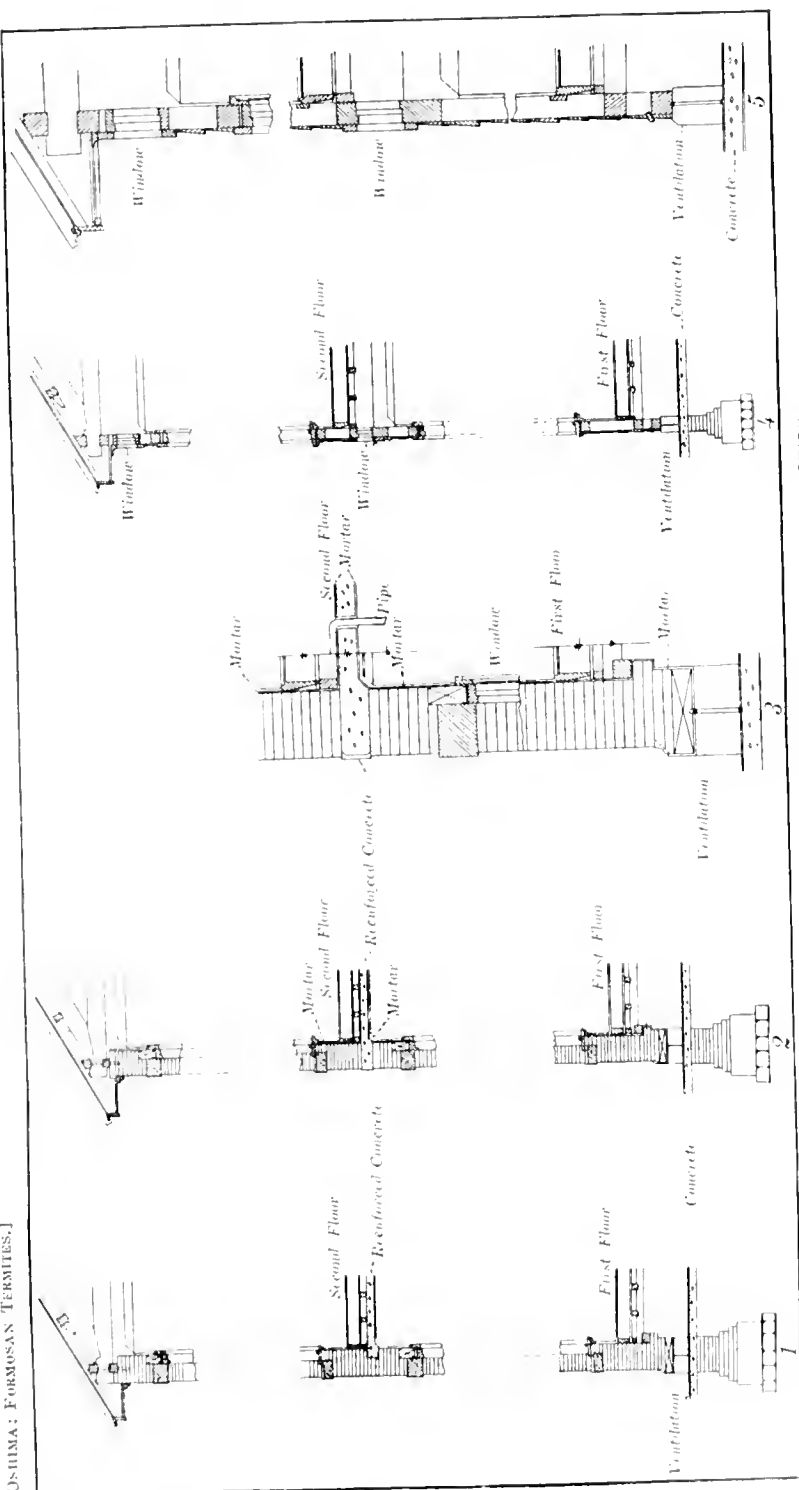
PLATE XIII. EXAMPLES OF TERMITE-PROOF BUILDING CONSTRUCTION.
